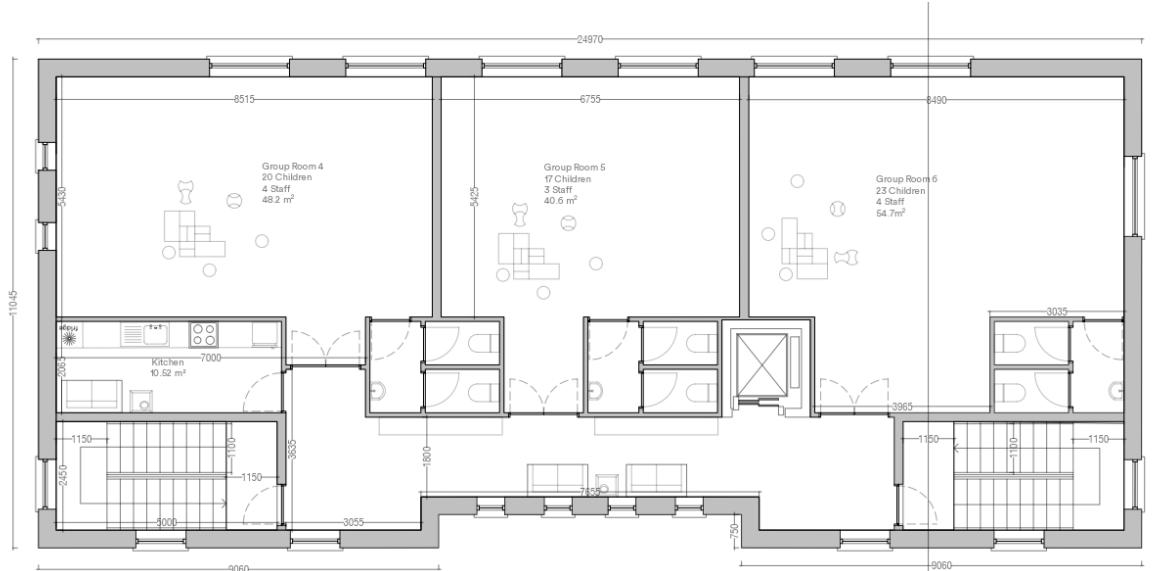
Extract from JFOC drawing - First Floor Creche Plan
